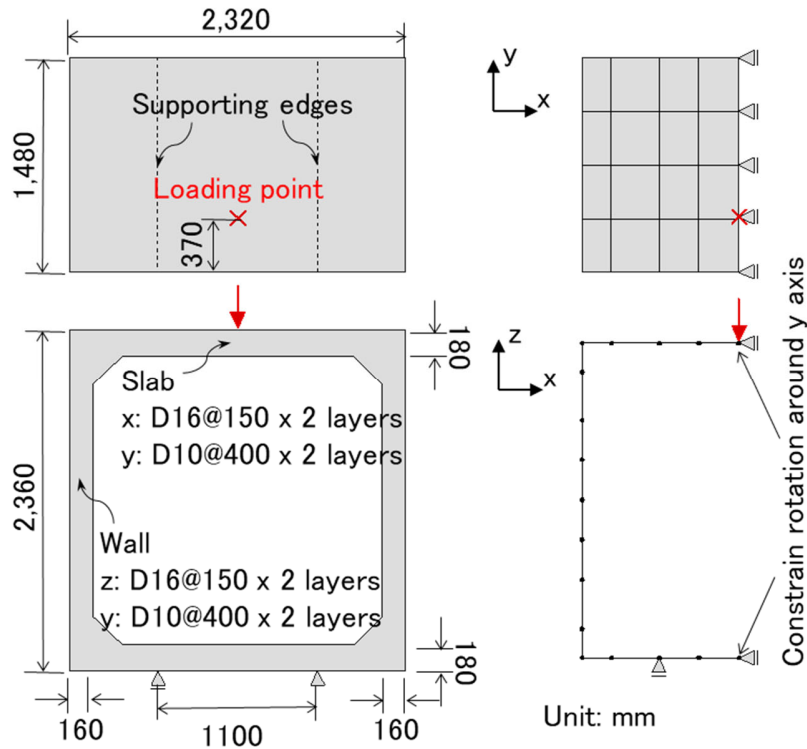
RC box culvert specimen. Figure 5. Modeling for RC box culvert.
